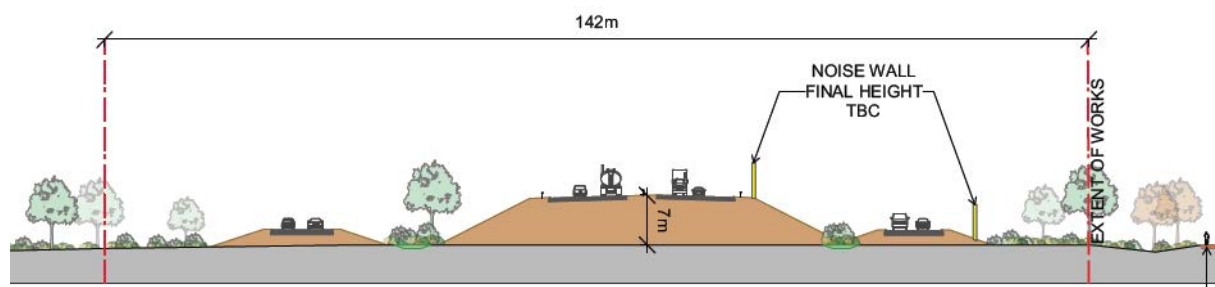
Typical mid-block freeway cross-section at approach to bridge structure including on and off ramps
